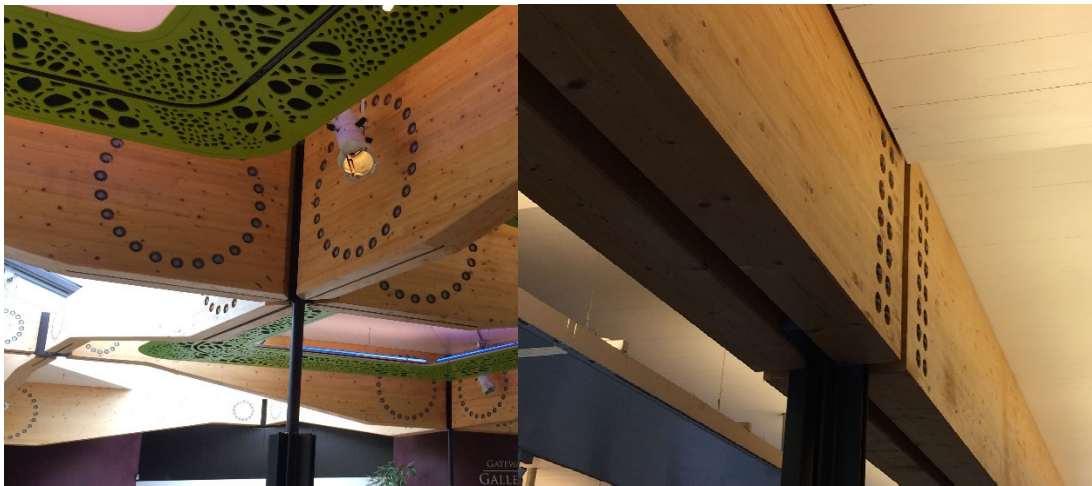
John Hope Gateway Biodiversity Centre, Edinburgh
